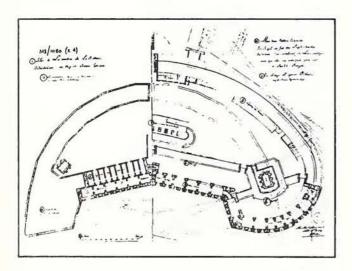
Proposed remodelling plan of the Amsterdam Battery, L.M. Thibault, 1791 (Cape Archives M1/1080).
